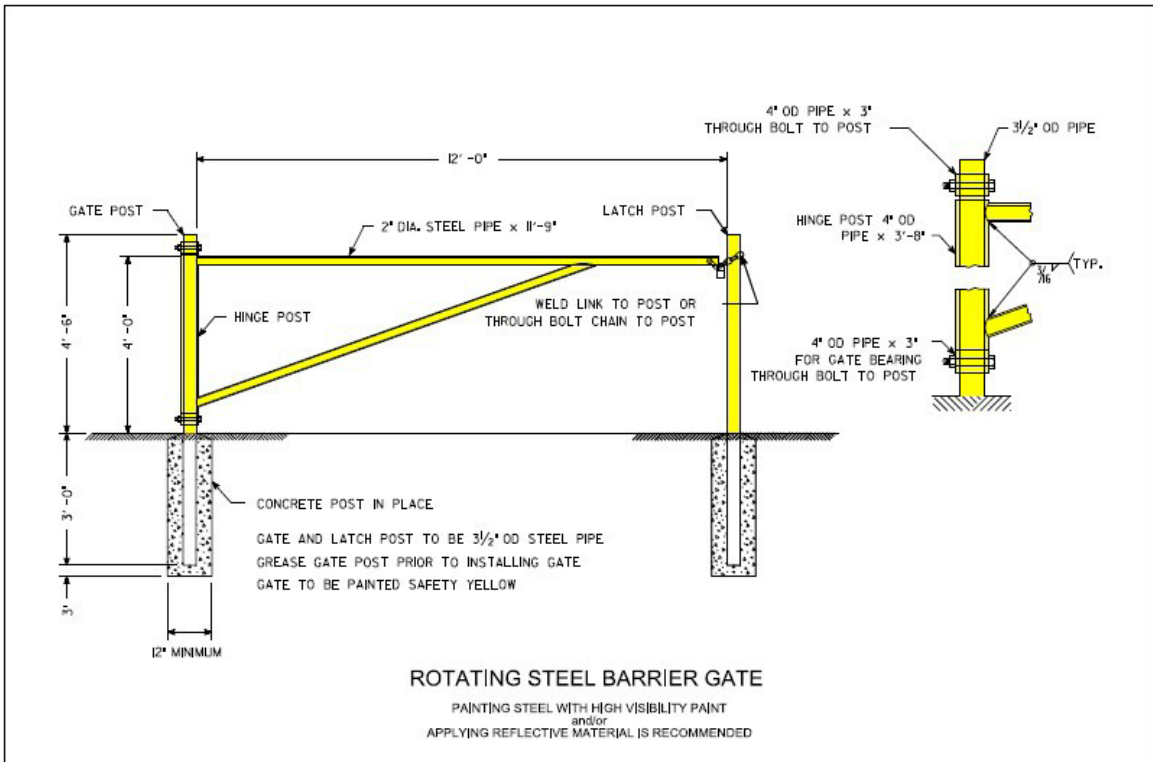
Representative design plan for a Steel Barrier Gate
